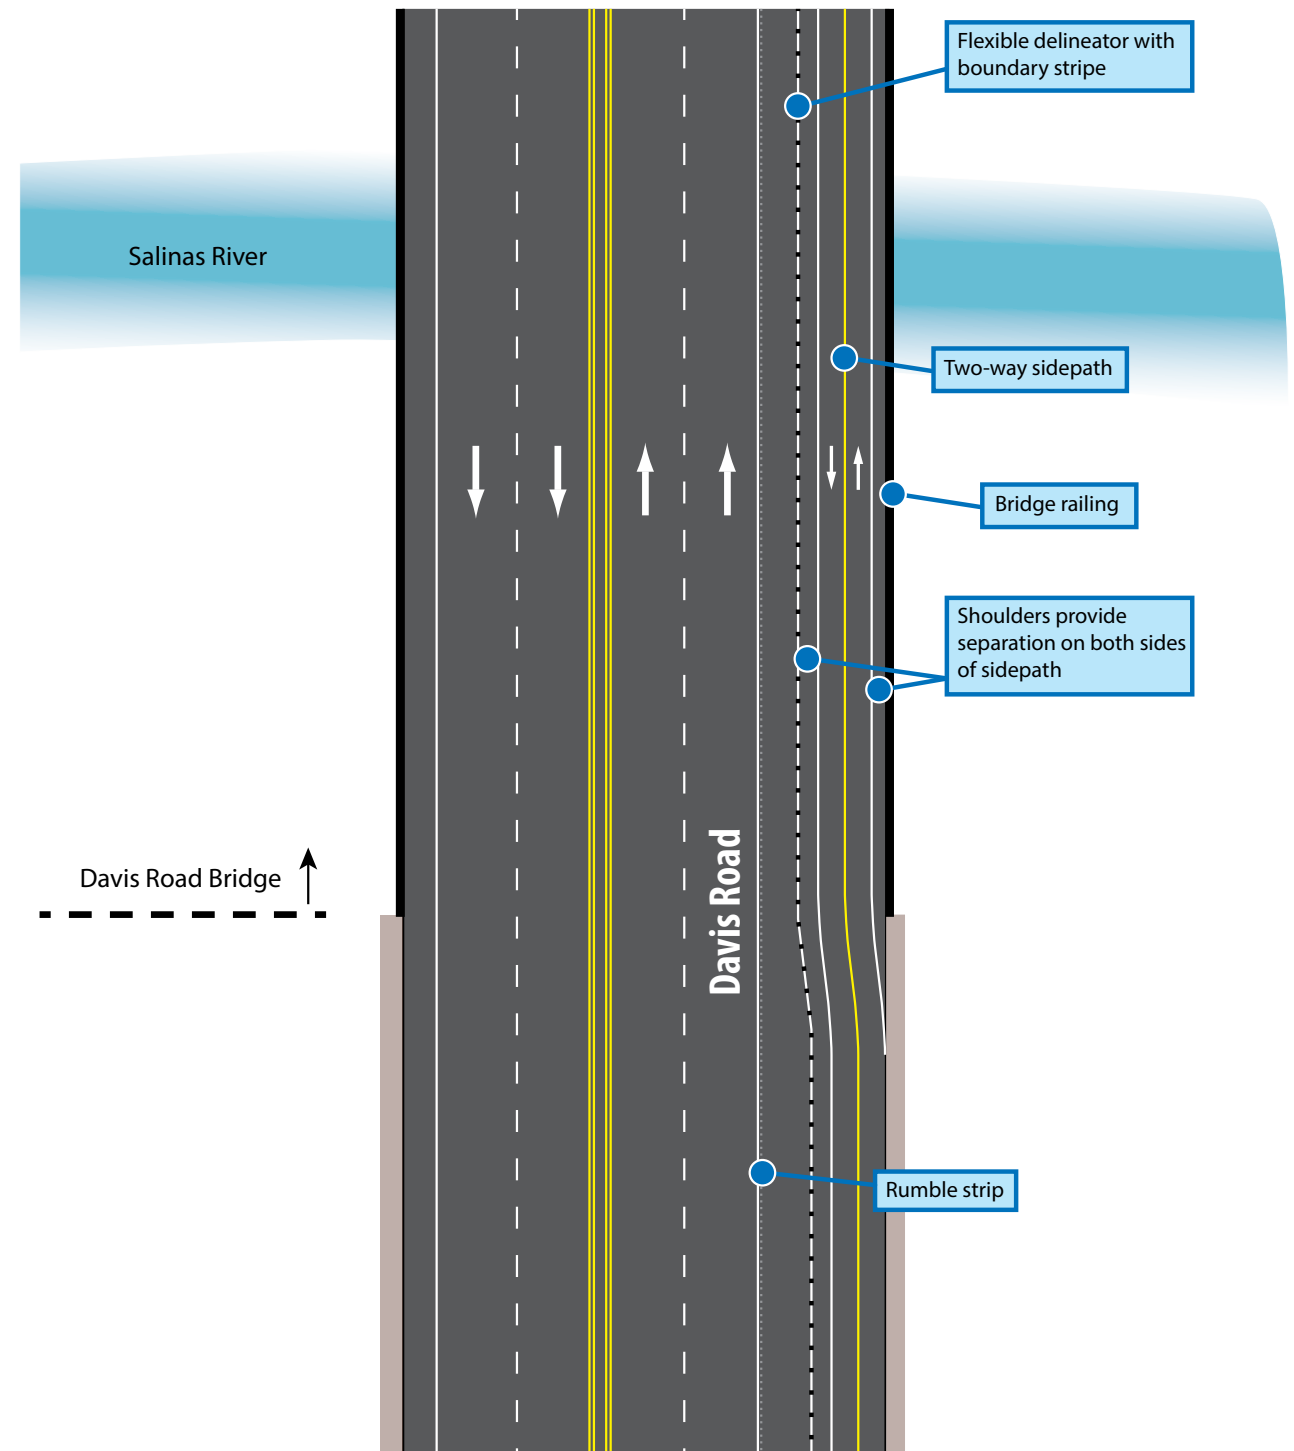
Typical Cross Section: South Davis Road (Salinas River Bridge)
